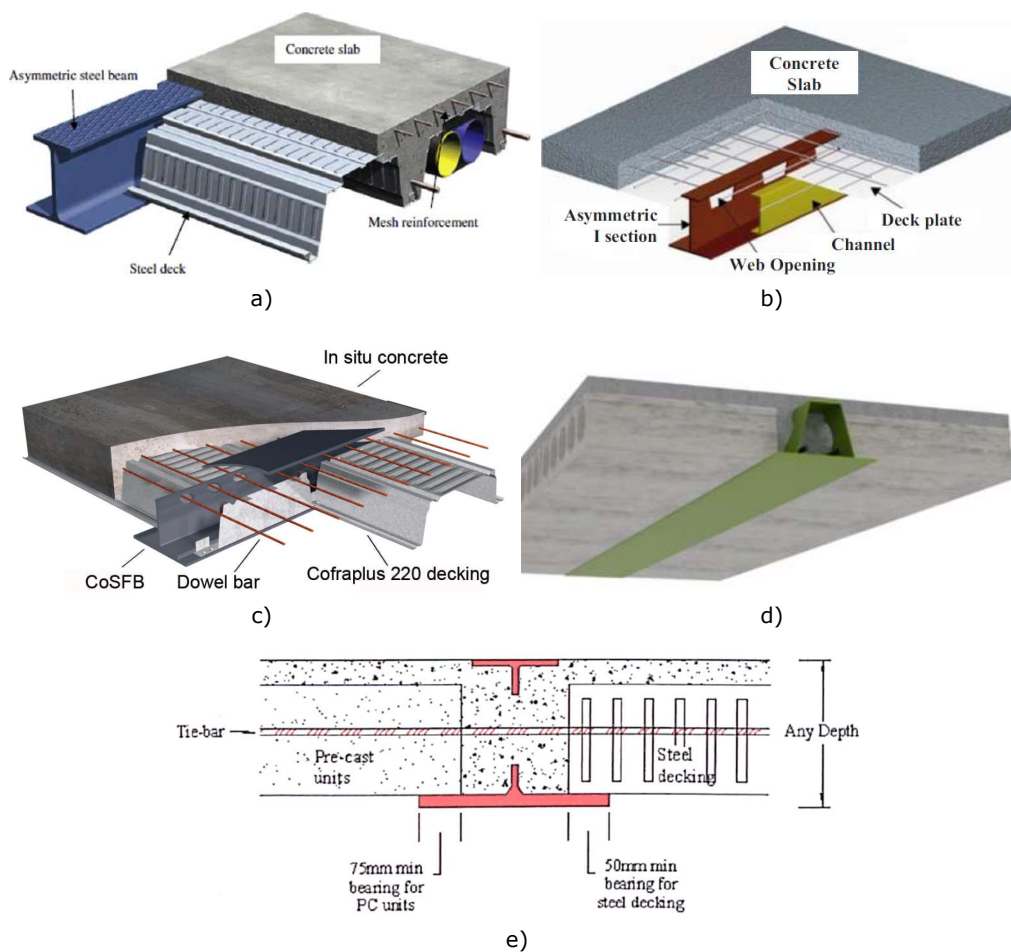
Examples of slim-floors from literature: a) *Asymmetric Slimflor® Beam* [12]; b) *iTECH* [9]; c) *Composite Slim-Floor Beam* [3]; *Deltabeam®* [13]; *Ultra Shallow Floor Beam®* [14]
